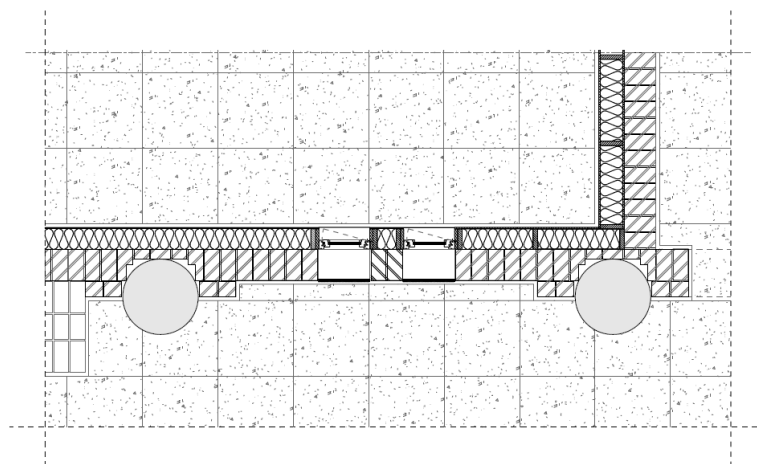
Horizontal façade section, ground floor: yellow Iraqi brick and stucco, with openable windows and the recessed column (Source: by author).
